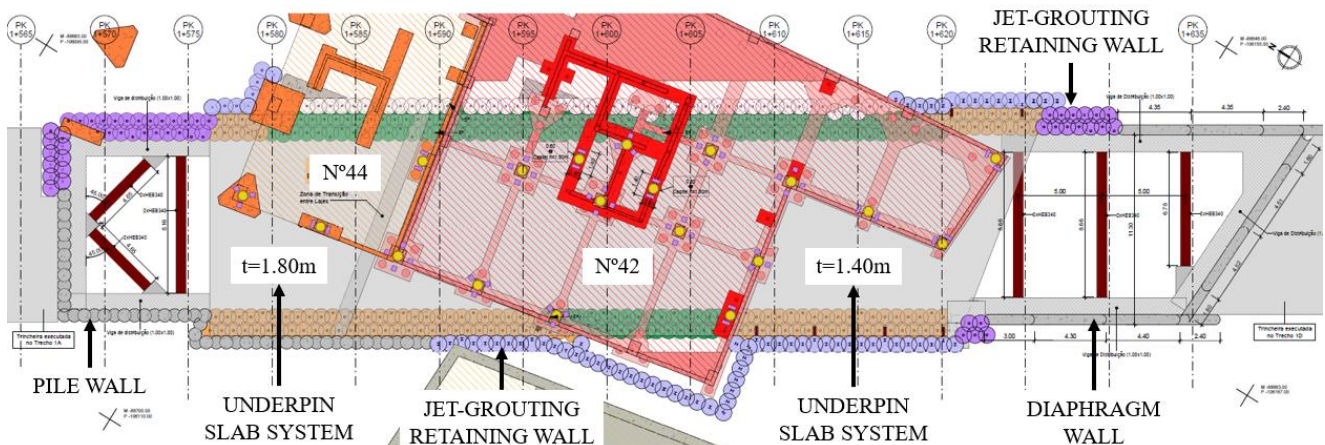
Plan view: Cut&Cover excavation and underpinning solution.
